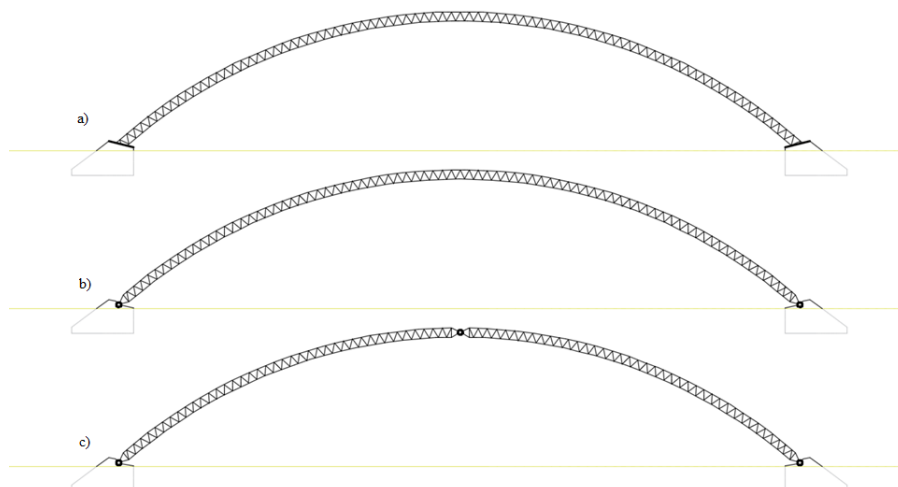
Section of the arch-type steel roof of the velodrome in a longitudinal direction [9]
